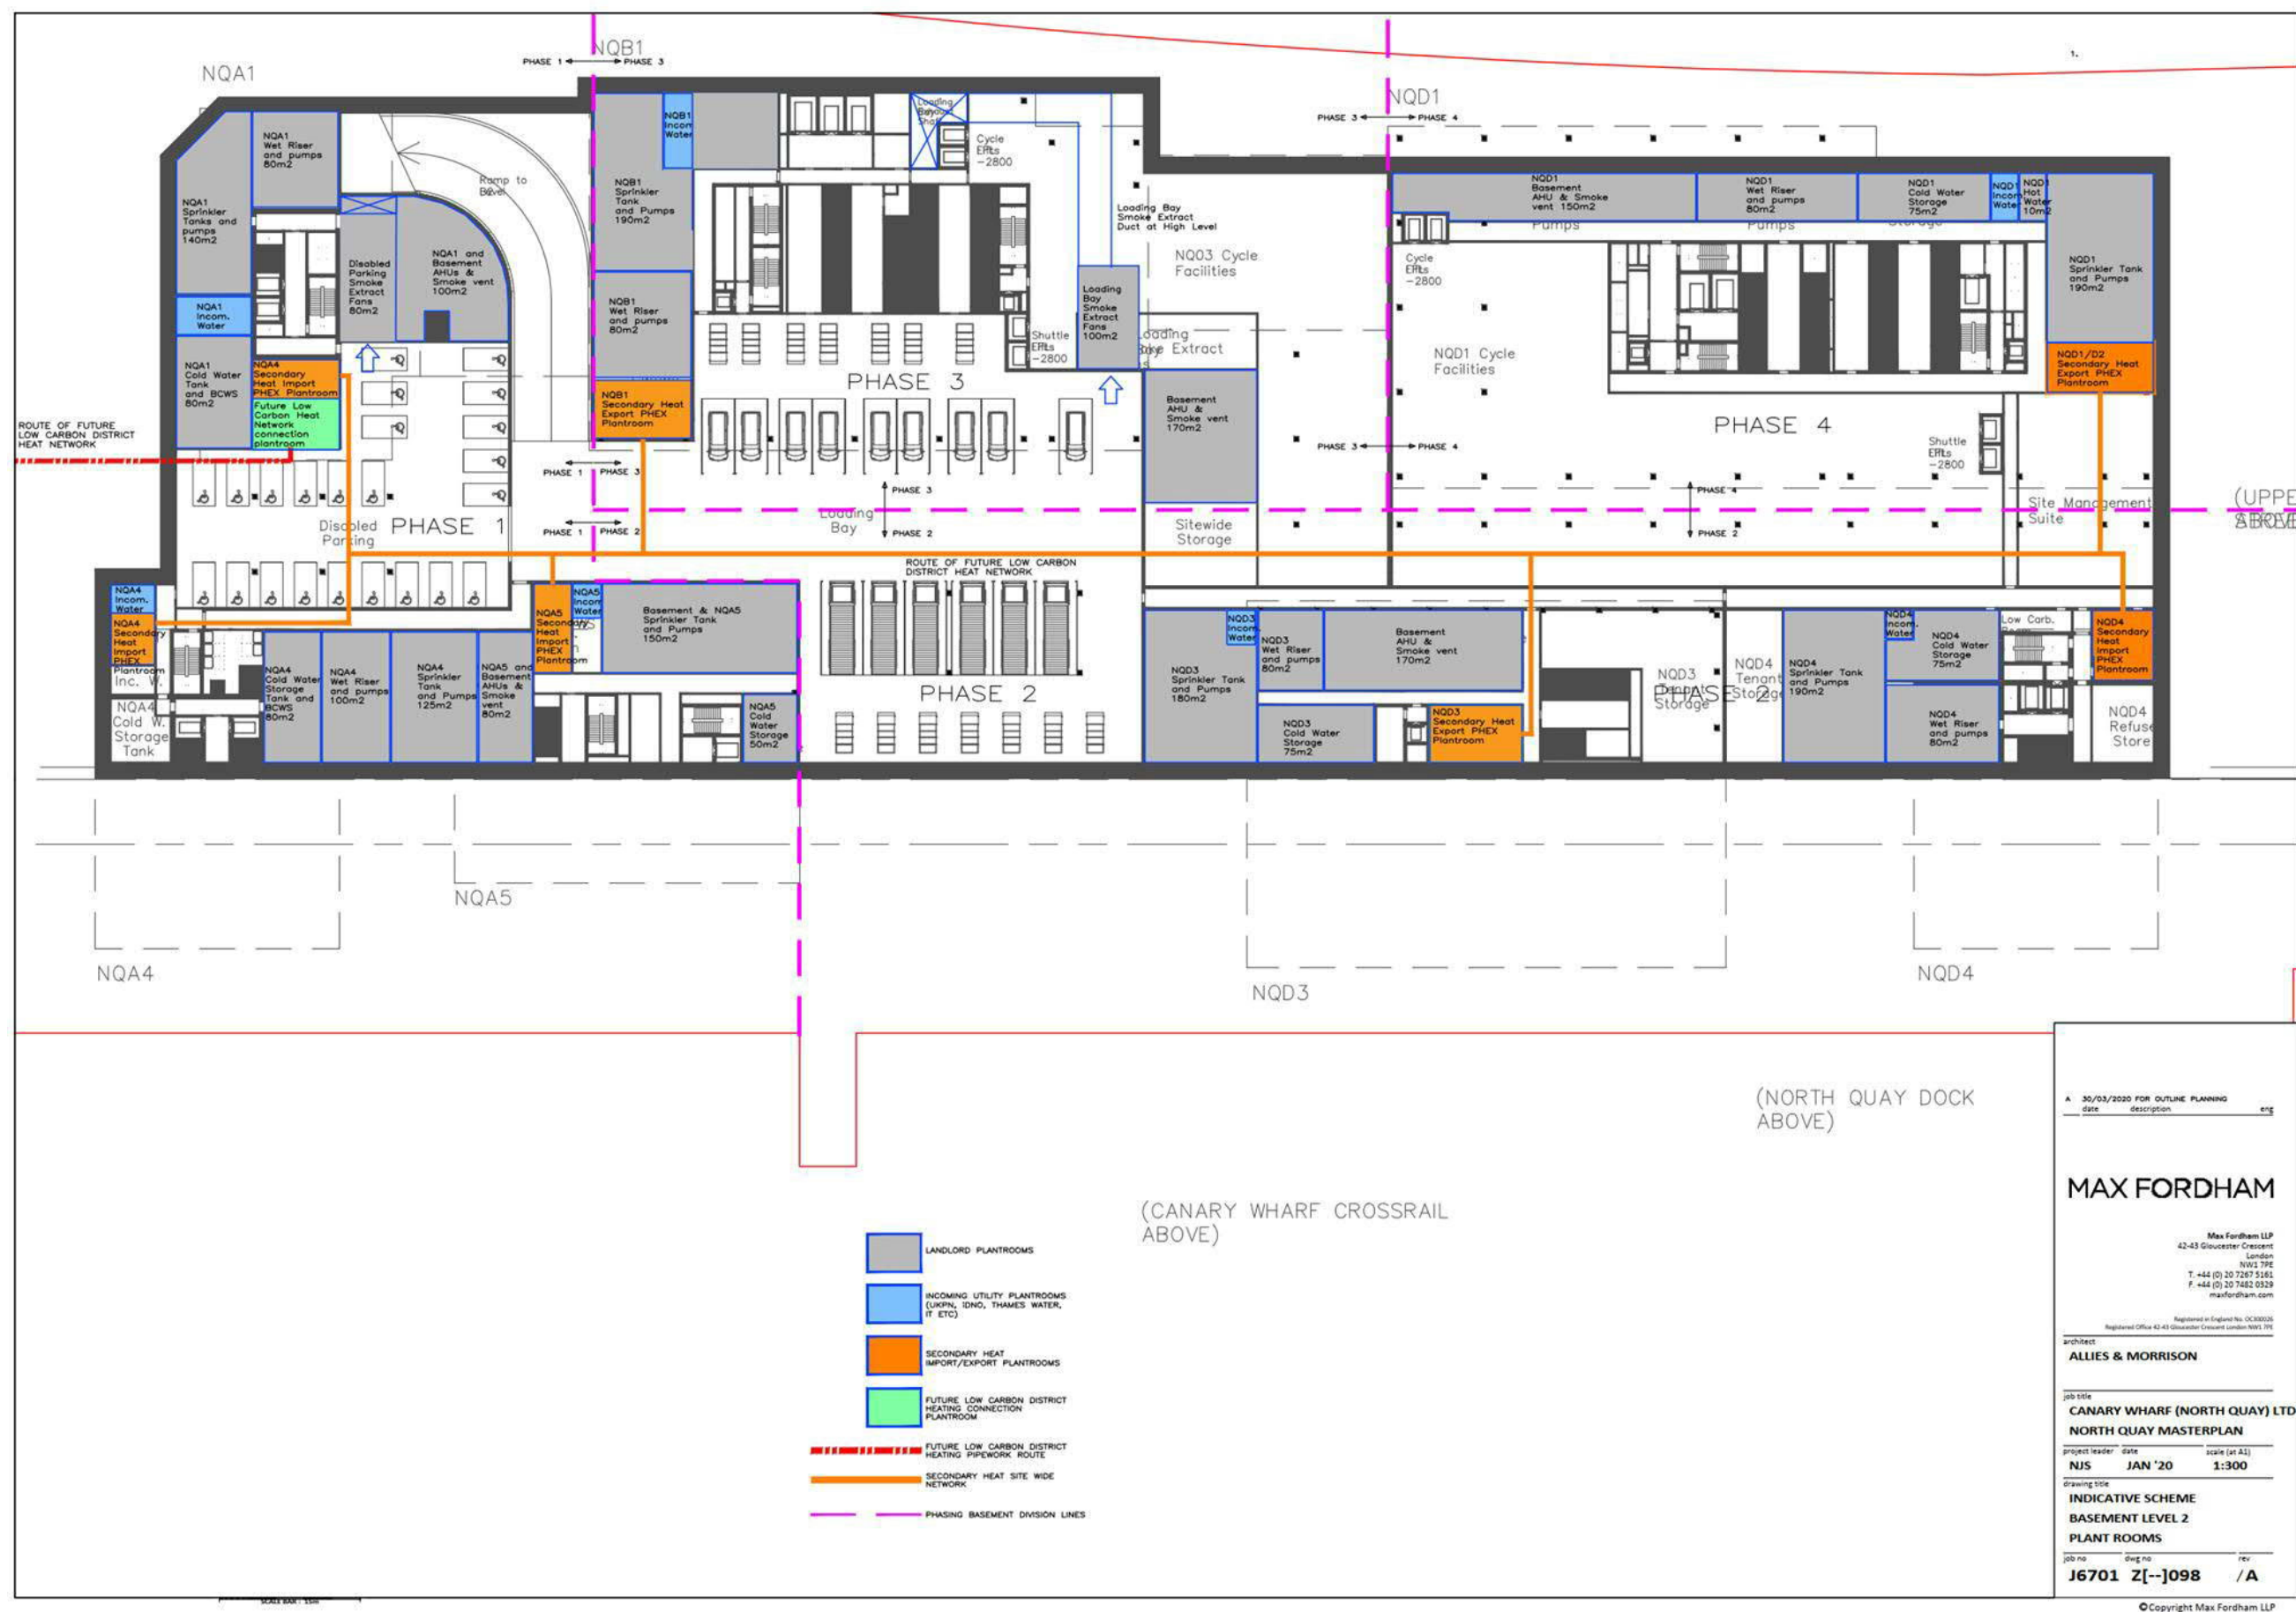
Future Low Carbon Heat Network Connection Plantroom and Site Wide Secondary Heat Network and Connection Plantrooms at Basement Level 2
